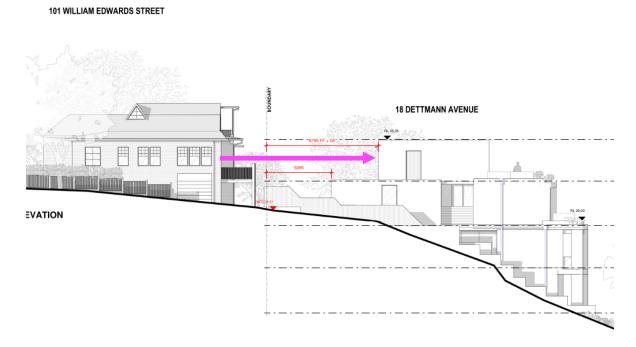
Elevational View from Neighbouring Property (Source: Architectural Plans)
